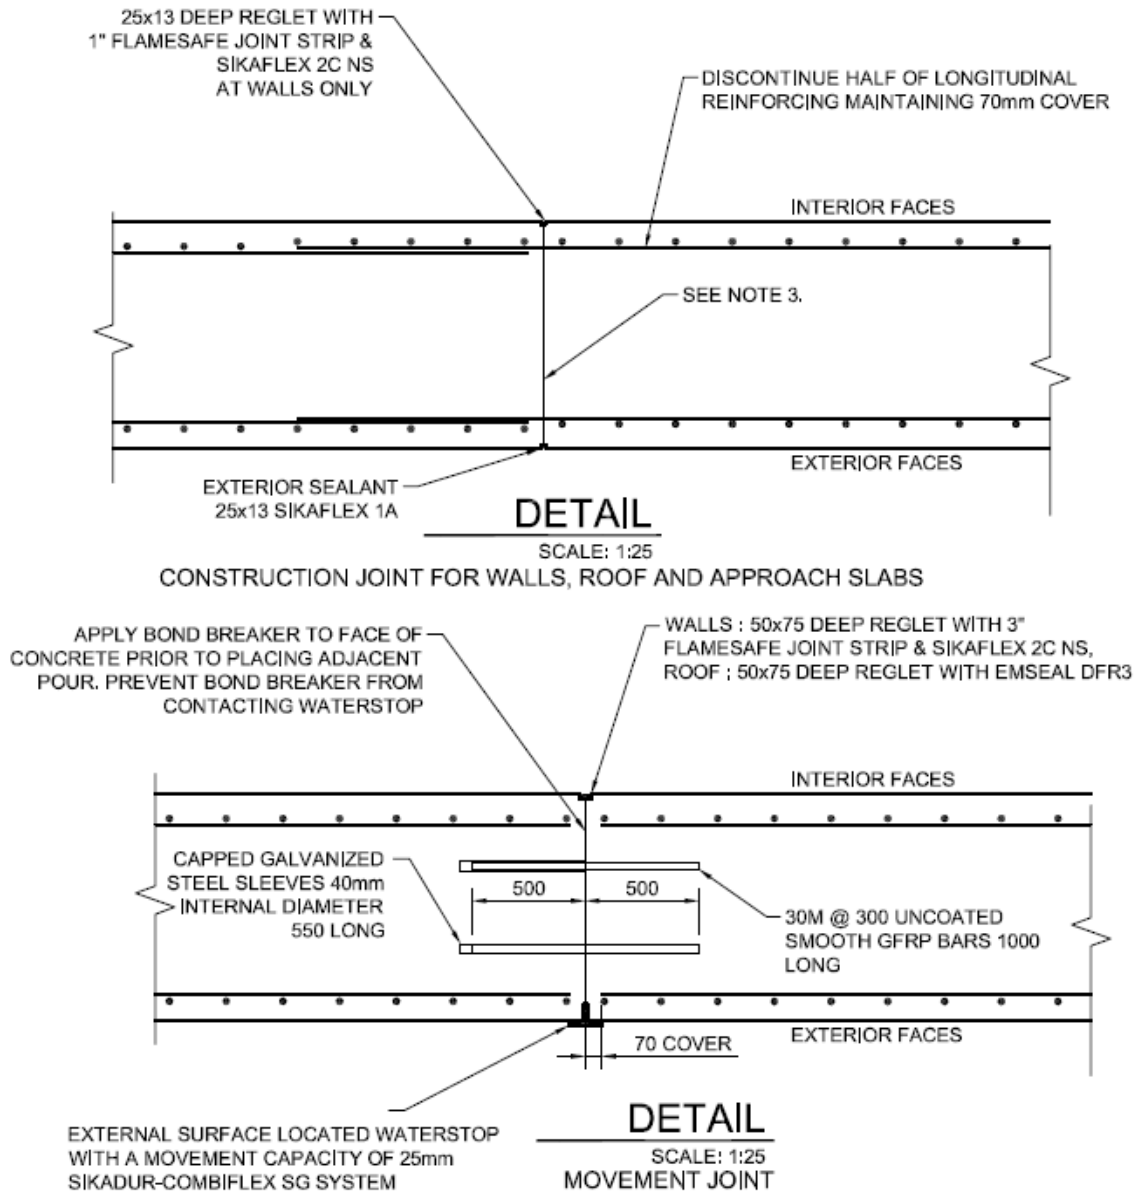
Typical construction joint and movement joint details (City of Calgary construction drawings)
